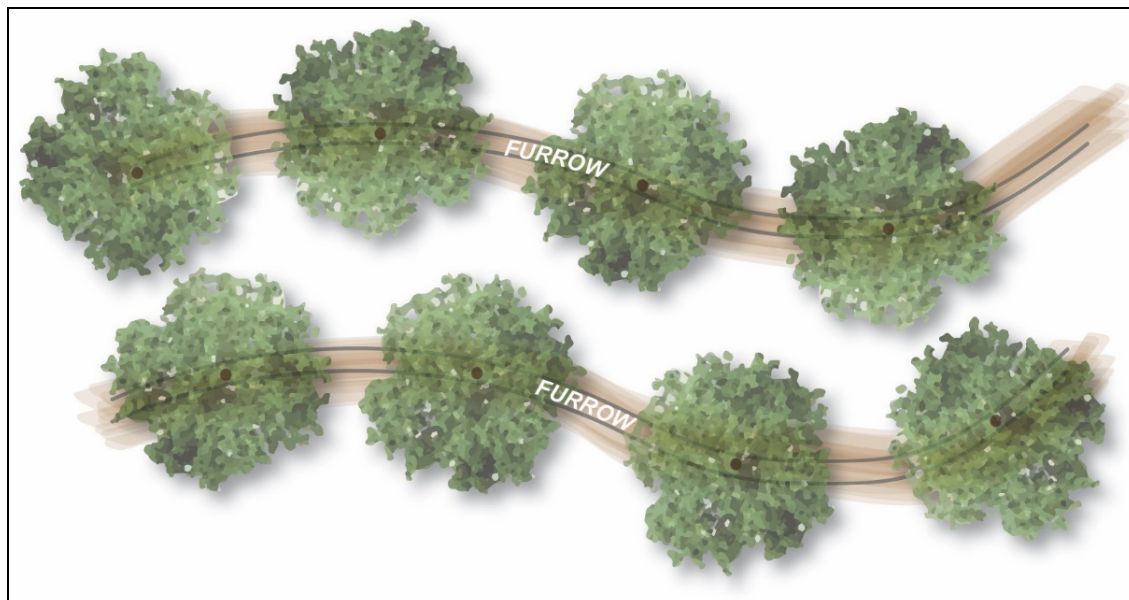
Dennis Underwood Conservation Area Furrow Planting Detail
